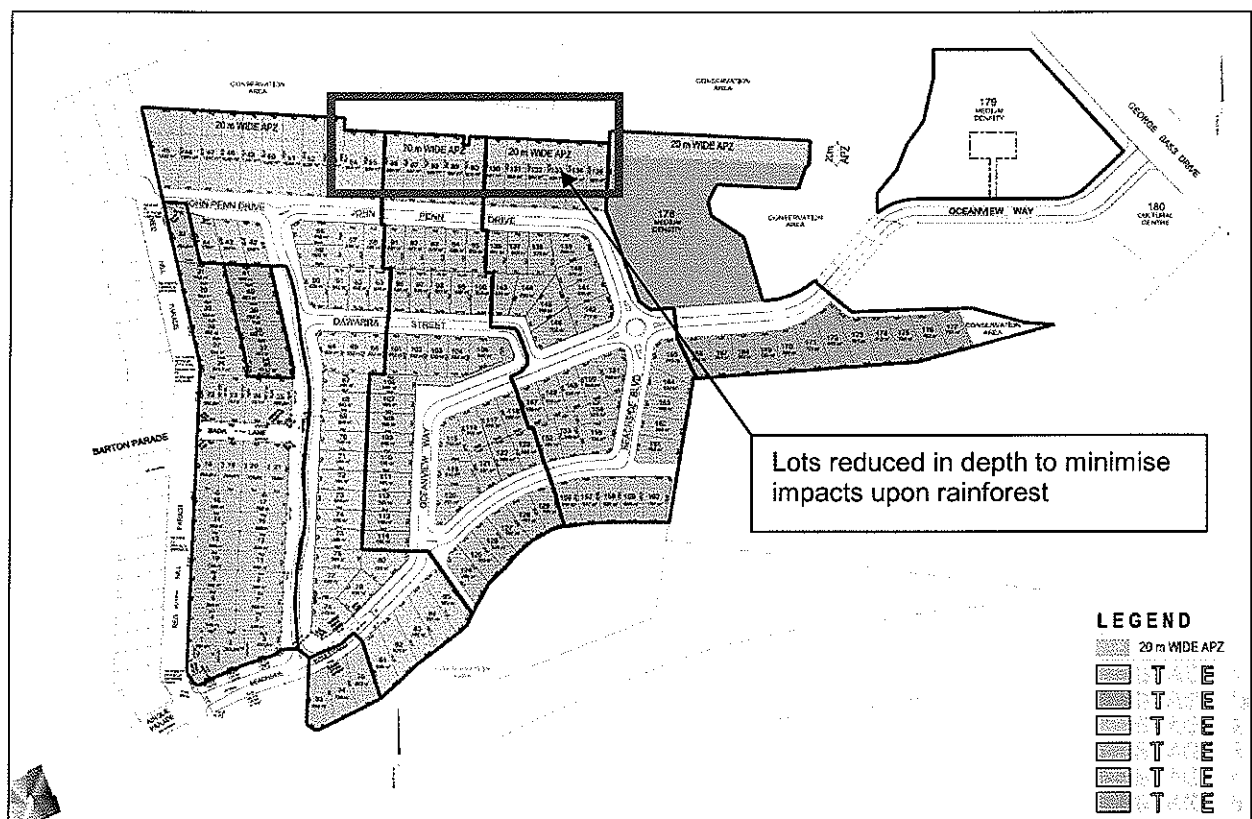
Final Plan of amended subdivision with lot changes along the northern boundary to the northern conservation area
